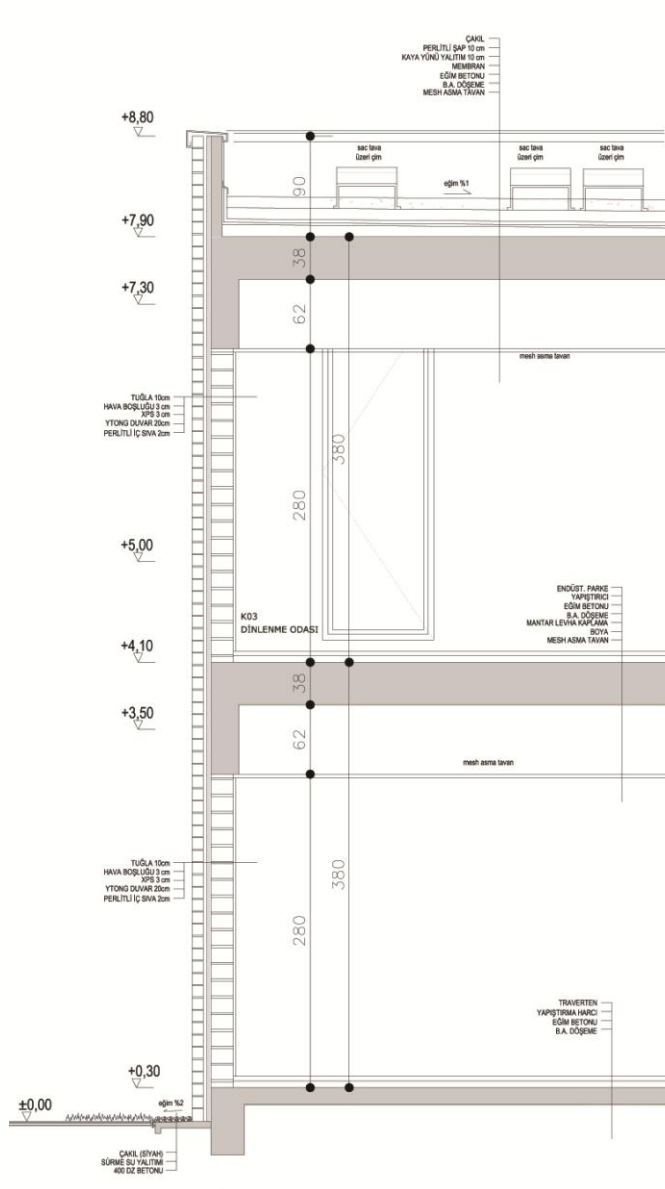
7: Case study A System detail (On the roof it is seen the roof pans for green roof)
